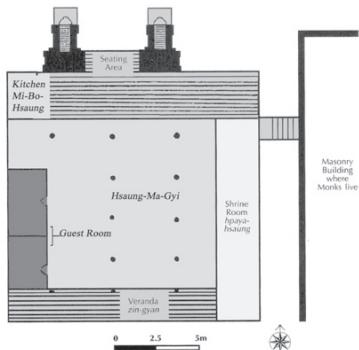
Plan of Nyaung-U Kyaung^{*8}
